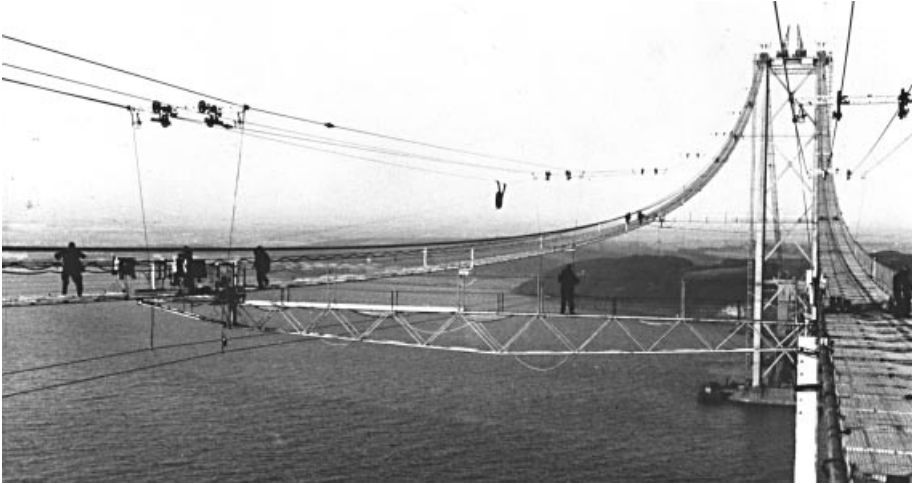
Cross bridge connecting the two catwalks (Firth of Forth Road Bridge)
